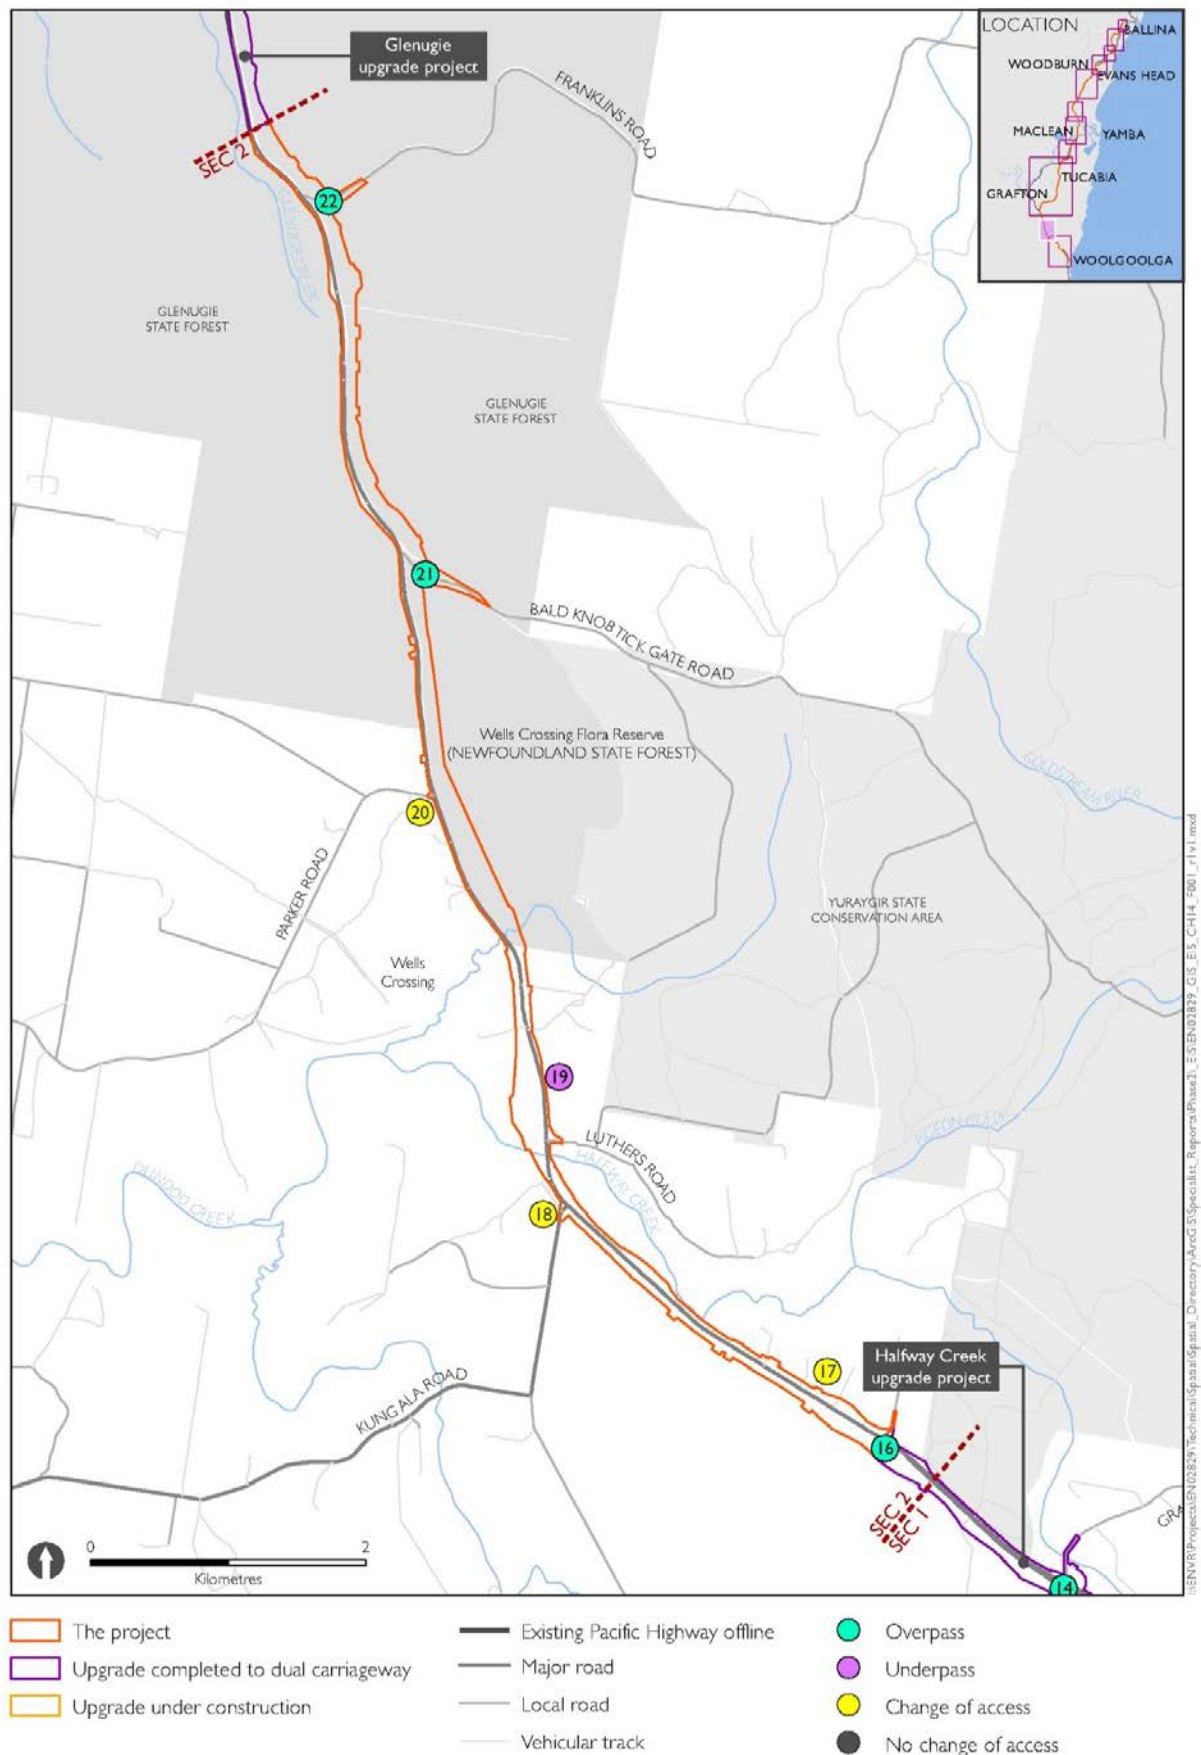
Locations of road alterations or changed access arrangements: Section 1
